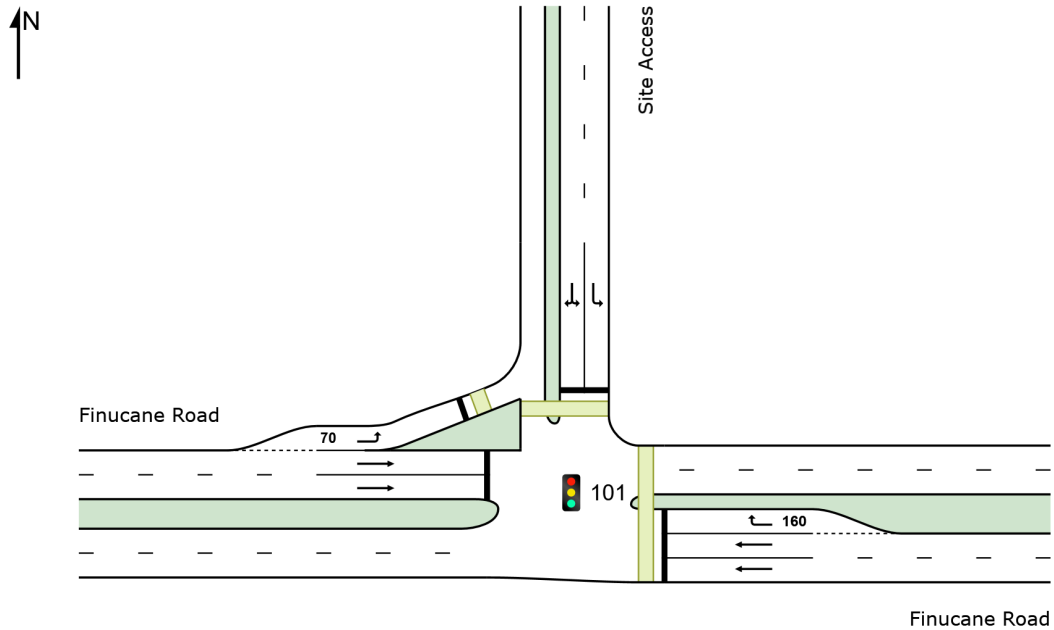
Proposed Finucane Road Signalised Access Intersection
